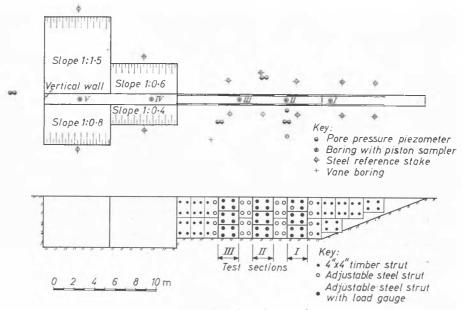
Plan and section of excavation Plan et coupe de l'excavation
